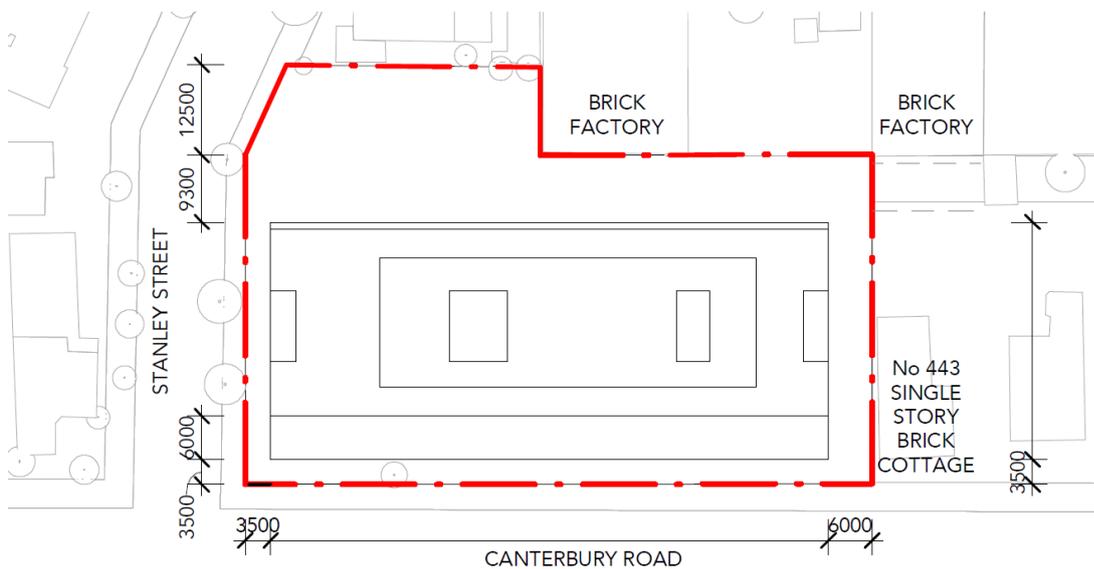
Site plan showing minimum setbacks (Source: Team2 Architects)
